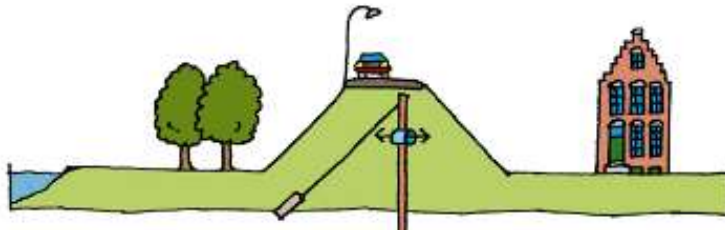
Schematic cross section of a dike with an anchored sheet pile wall
